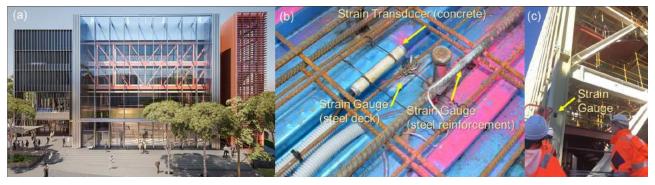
(a) Woodside Building for Technology and Design, Monash University Clayton Campus (b) Sensors installed in building's composite reinforced concrete deck (c) Sensors installed in building's steel bracing
